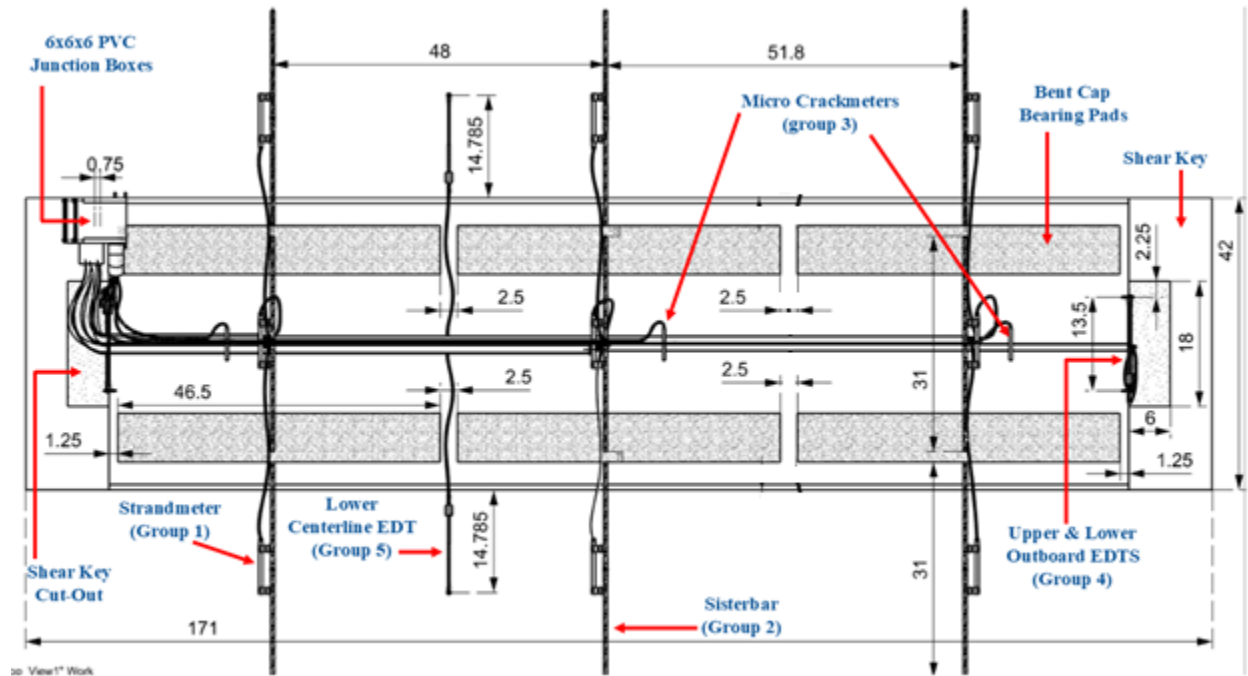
Drawing, Bent Cap Top View (Slabs, Beams, and Parapets not Shown)
